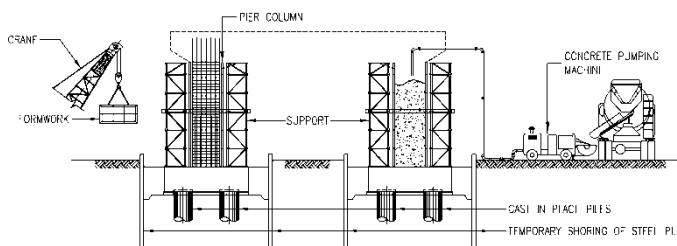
Illustration of a Pile Cap Construction for the Overlapped Section
